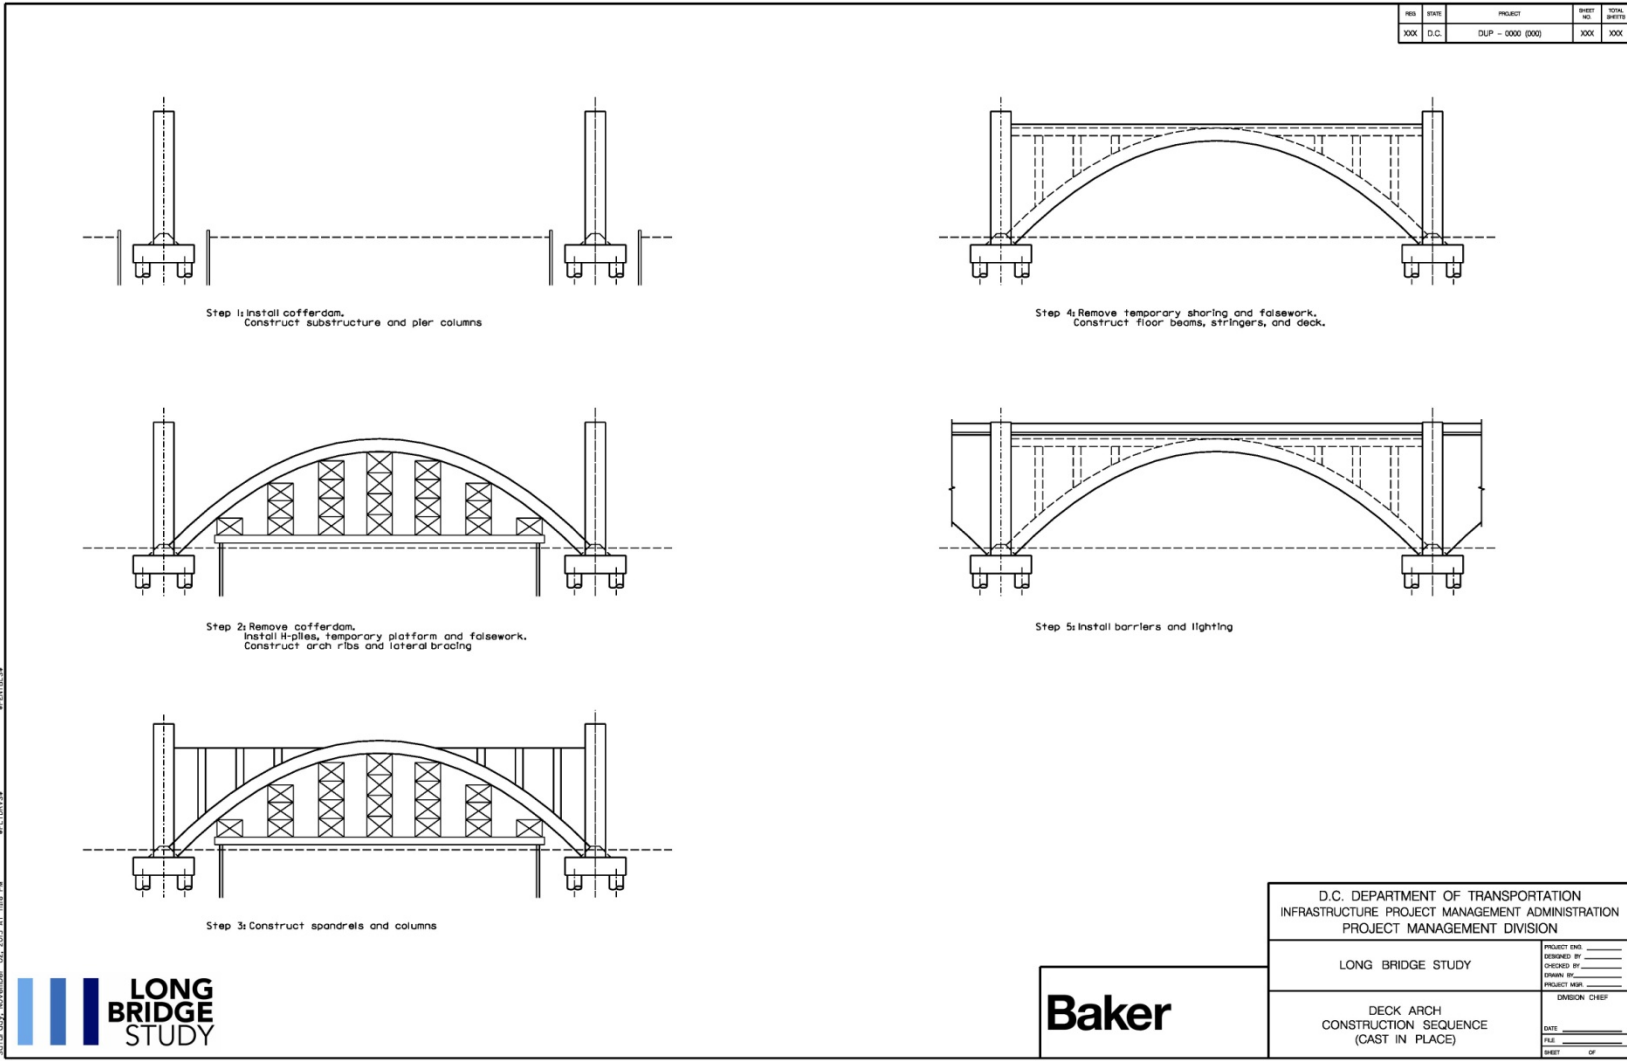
Concrete Deck Arch Construction Sequence – Cast in Place
